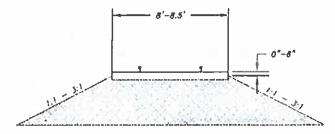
Commonly Occurring Rail Bed Cross Section from MP 61 to MP 120
